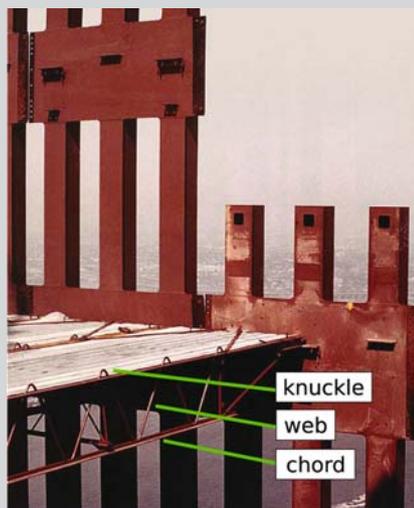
Figure A. Images of the exterior wall columns and floor truss assemblies during construction of the towers. The figure shows the major structural components and how they were assembled (Source unknown).
